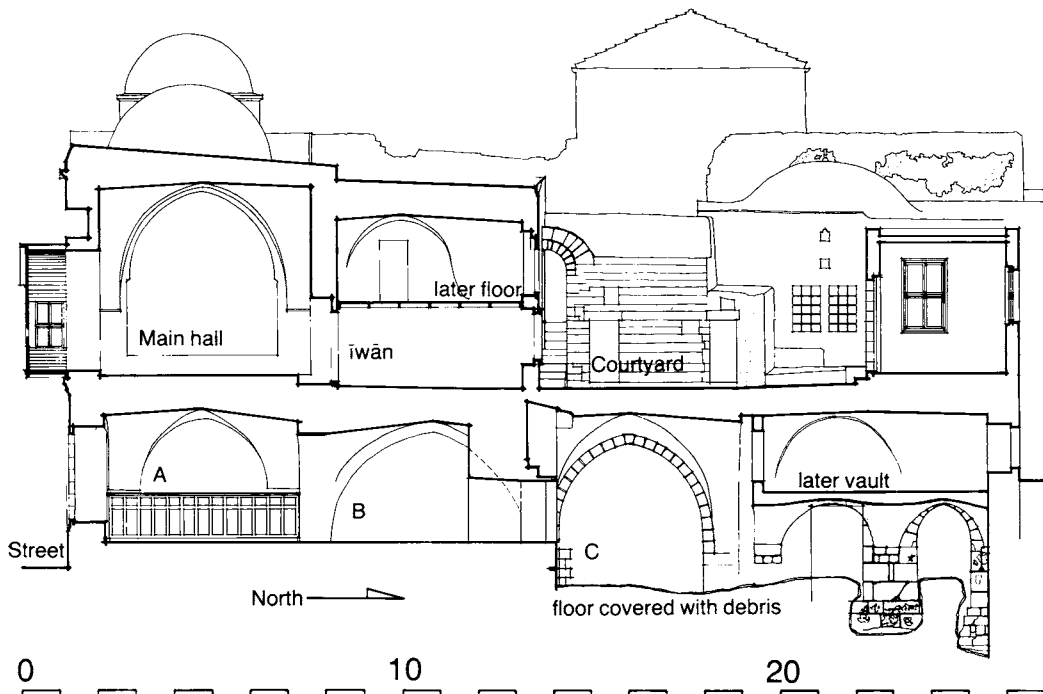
South-north section through halls 'A', 'B' and 'C' looking west
